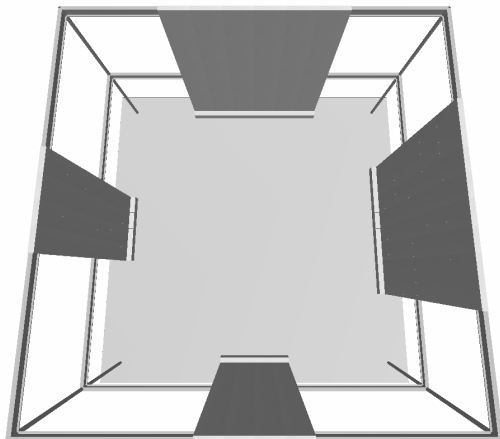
Analysis Model of Wall with Non-symmetrical Wall Layout.
